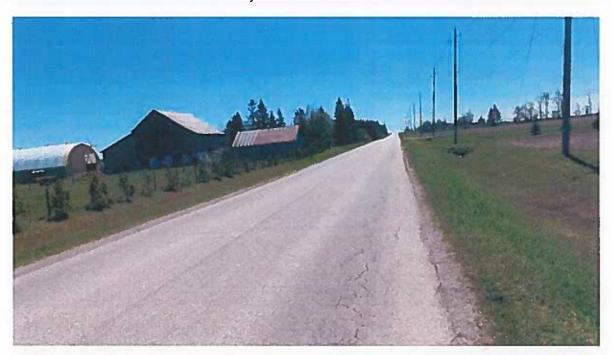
Location of BH 7, looking East. Moderate wheel-path rutting and cracking, slight centerline joint cracking and slight flushing
